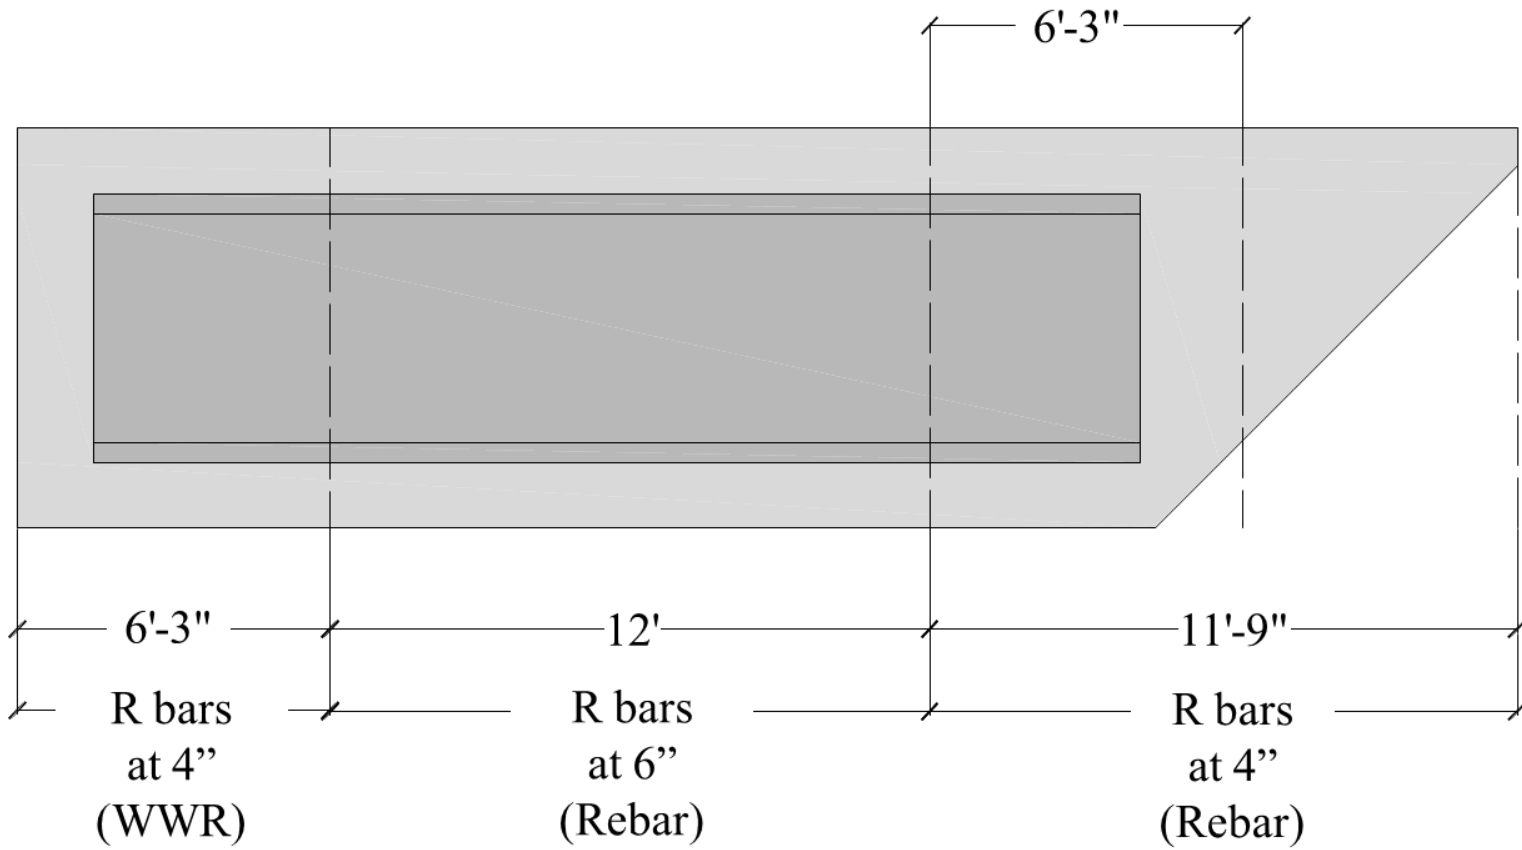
Beam 2 primary shear reinforcement (R bars) layout
